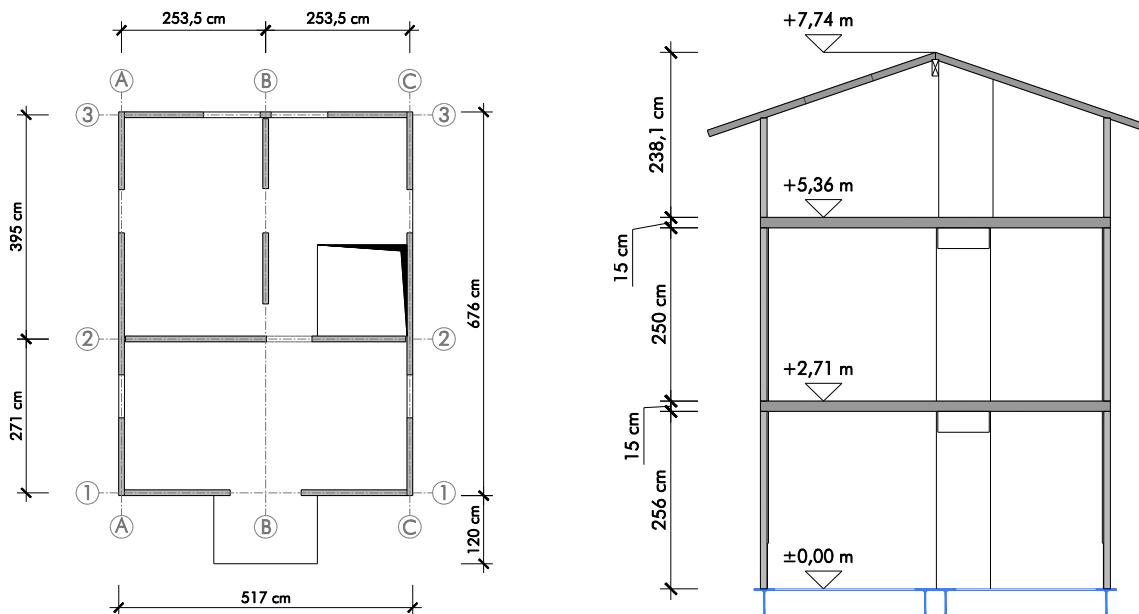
Horizontal plan (second floor) and vertical cross section
